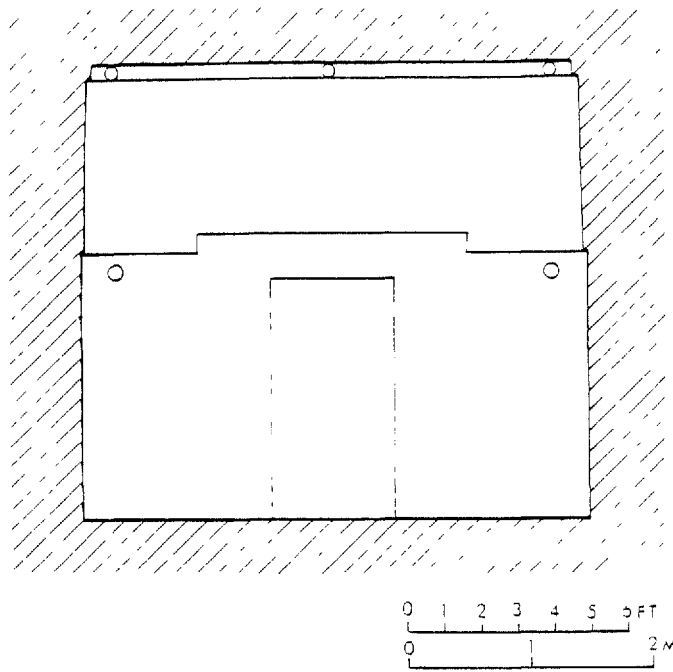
Structure 1, East Wing. Detail of offset in vault over doorway to room 10.
